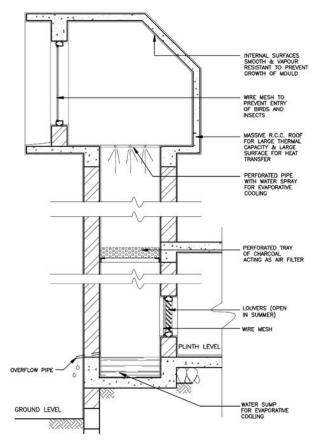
Cross Sectional details of Passive Downdraught Evaporative Cooling.
